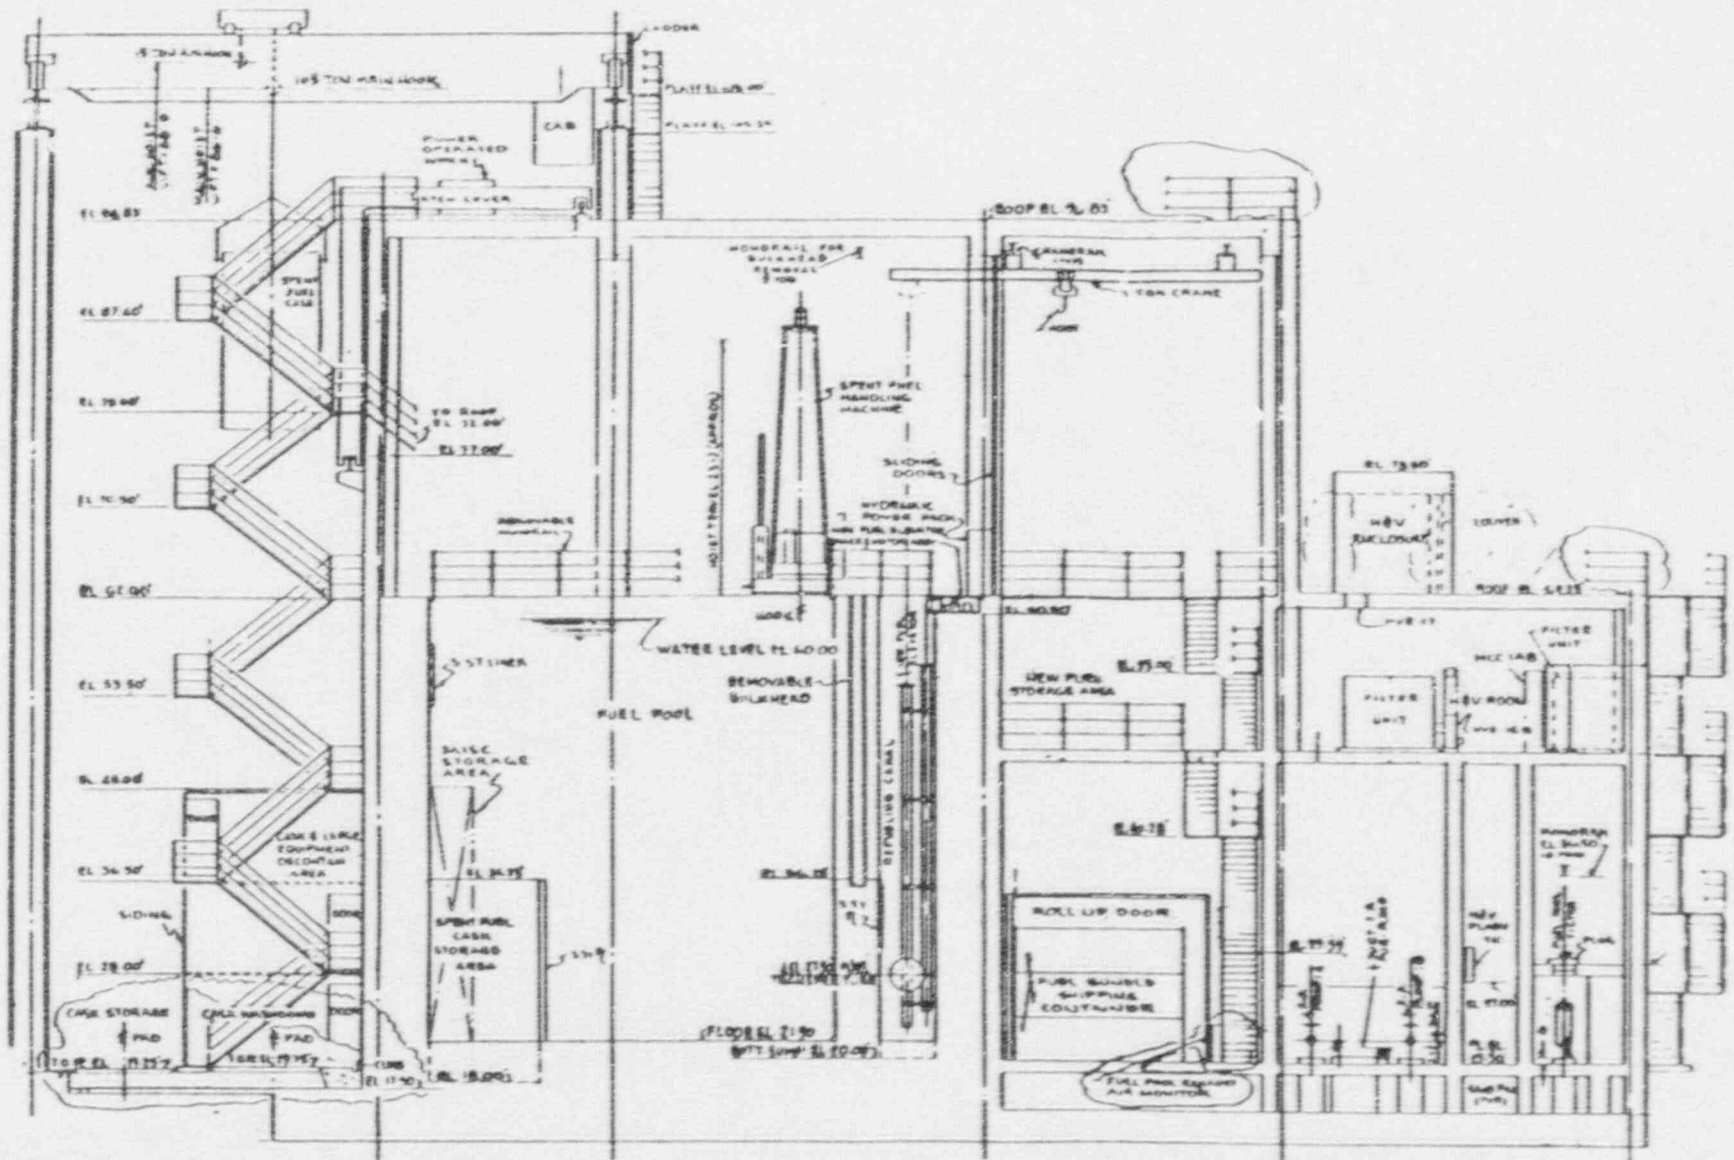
St. Lucie 1 Fuel Handling Building Section View
